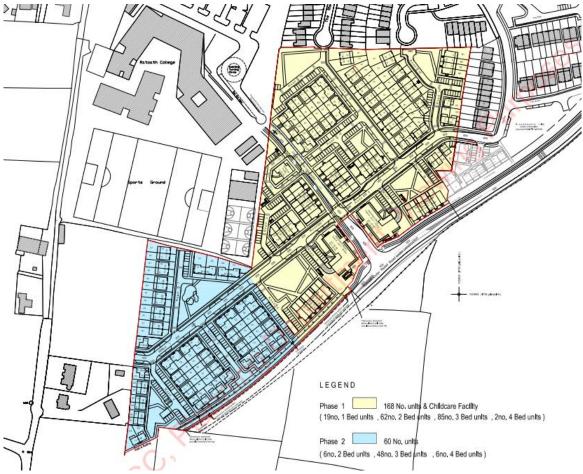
Site Layout Plan from SHD Application TA17.305196
